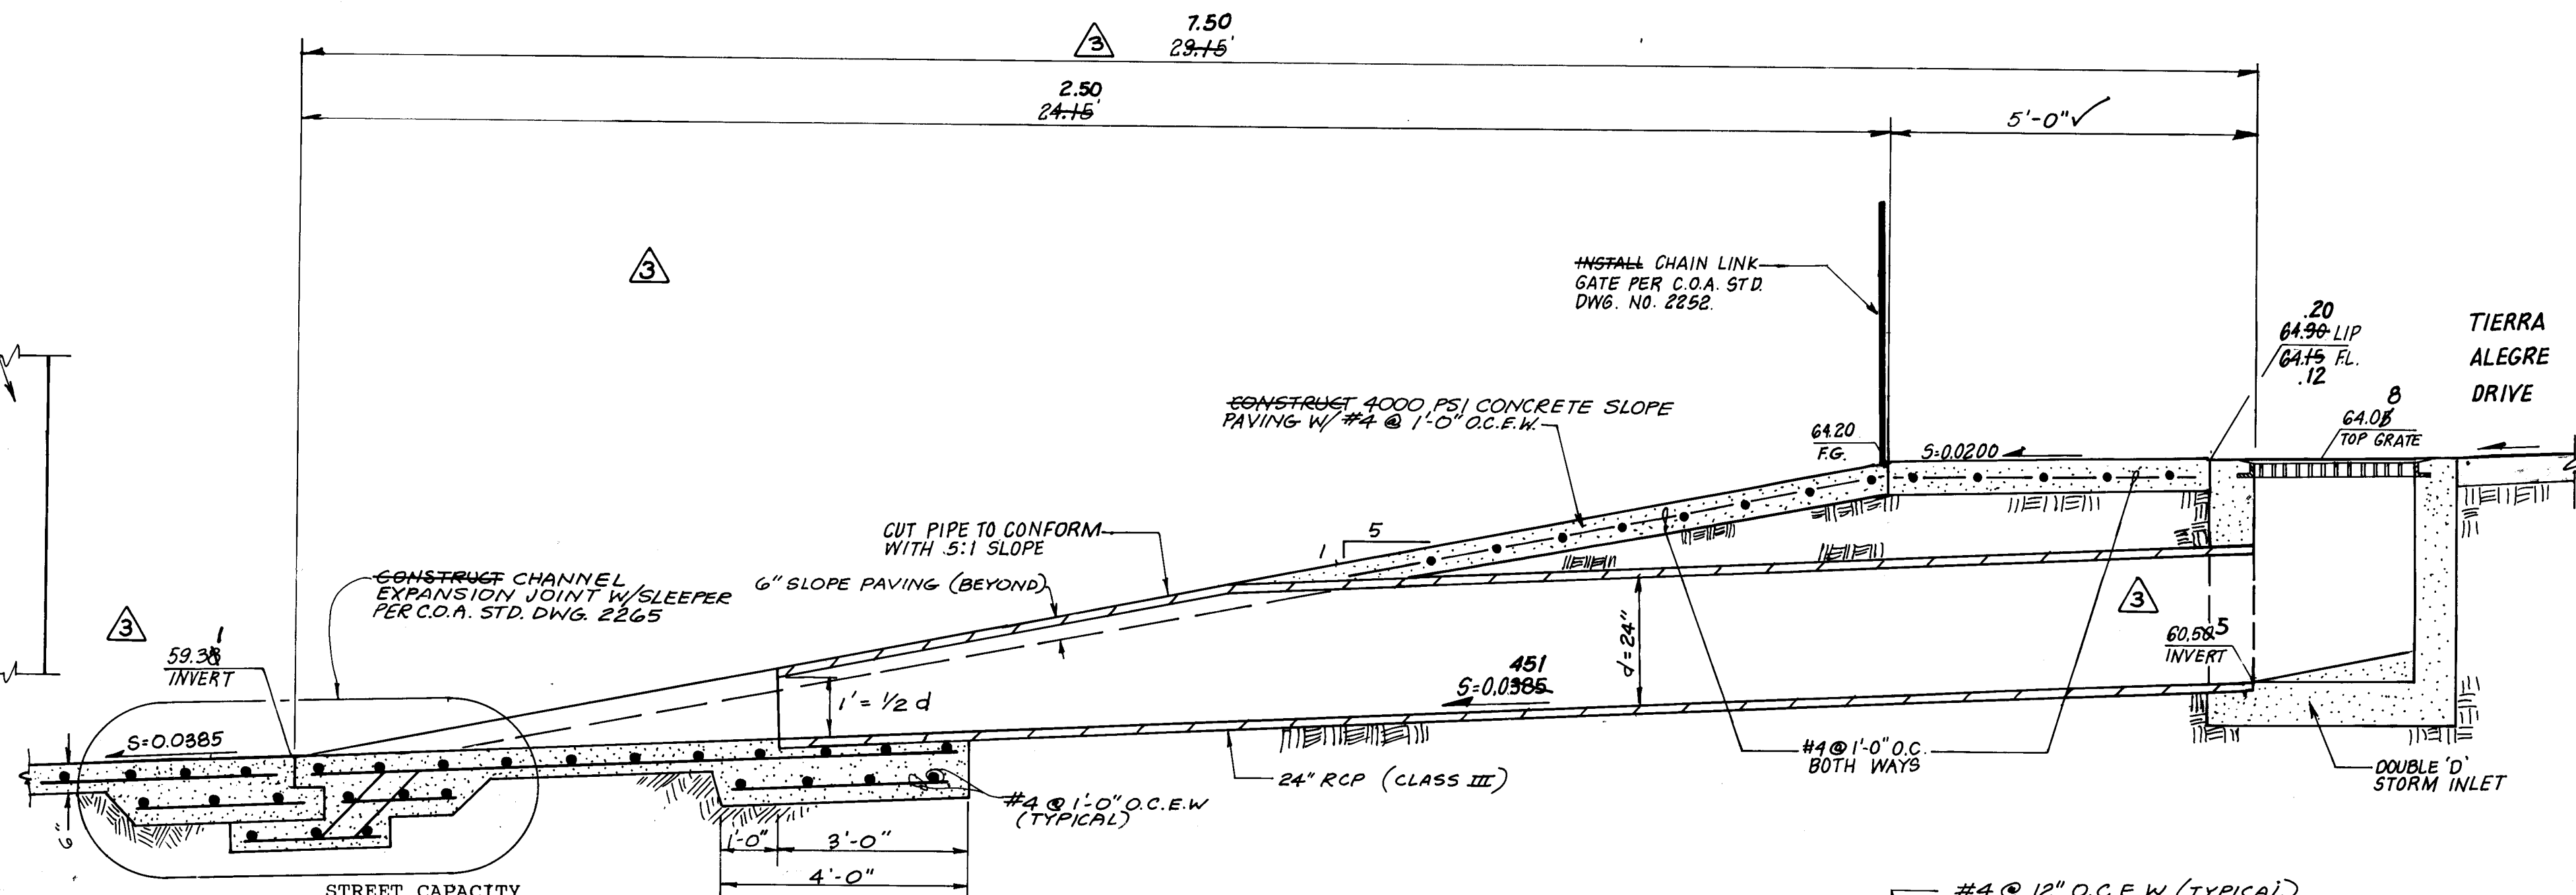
SCALE: 1"=10' 3.5 16.12
